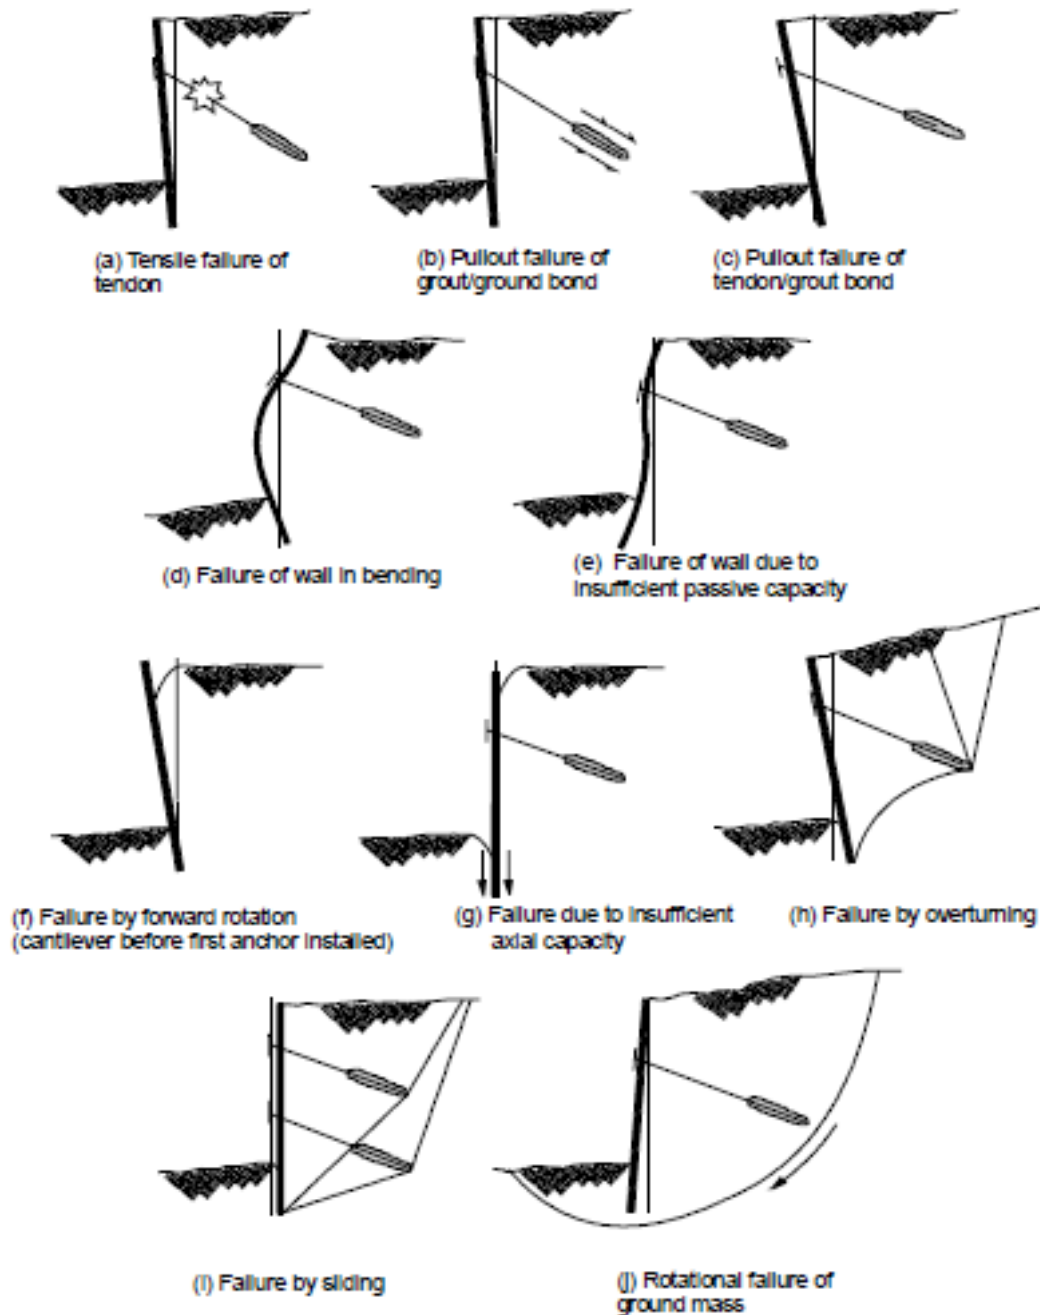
Potential failure conditions to be considered in design of anchored walls
